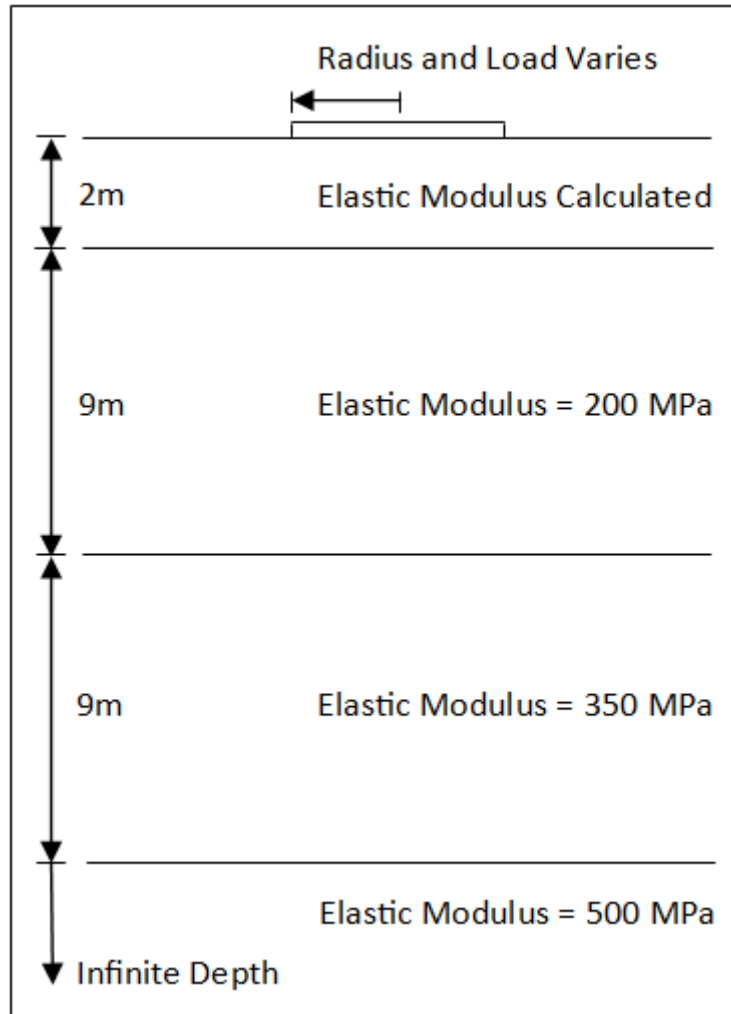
Pavement and supporting structure used in Evercalc back-calculation of pavement elastic modulus.
